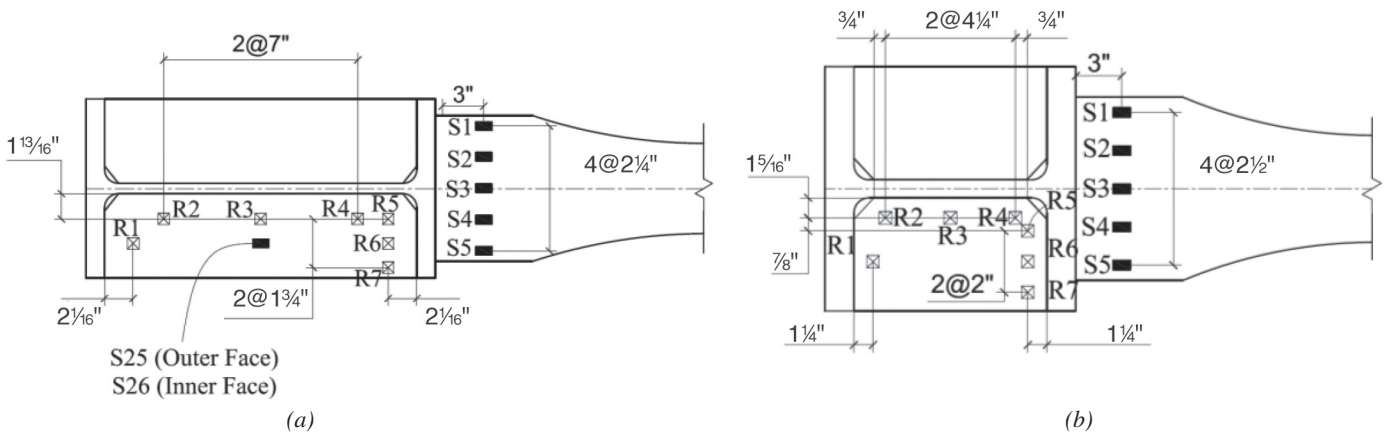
Strain gage and rosette layout (beam top flange level): (a) specimen C1; (b) specimen C2.
